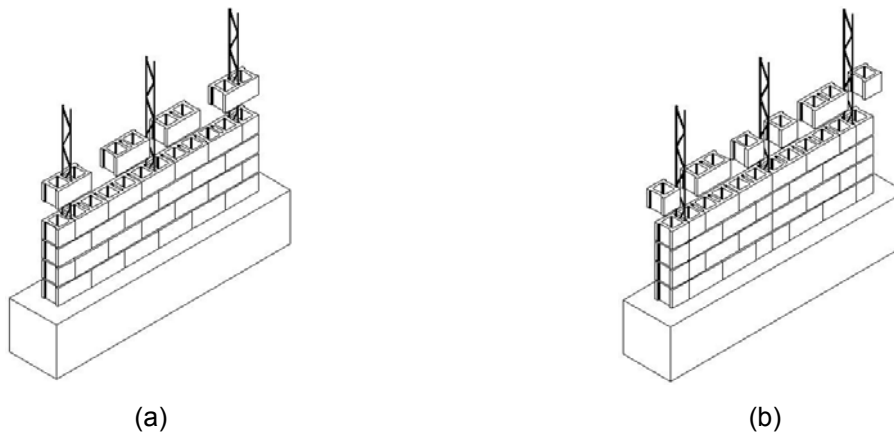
Masonry bond patterns: (a) running bond pattern, B1 (b) bond pattern with continuous vertical joint, B2.
